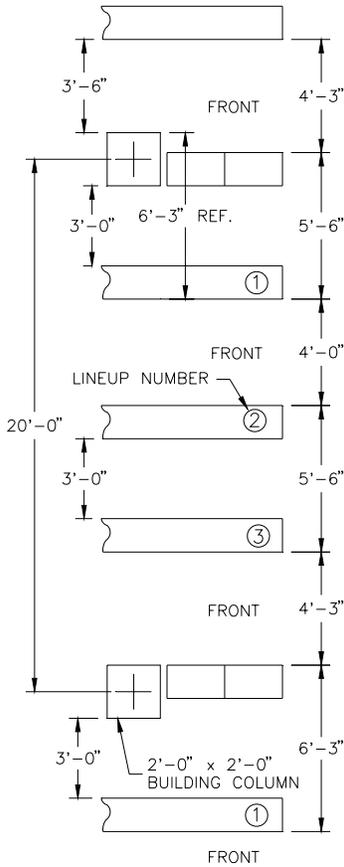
C) Lightly Cabled Equipment And Limited Floor Space Applications
